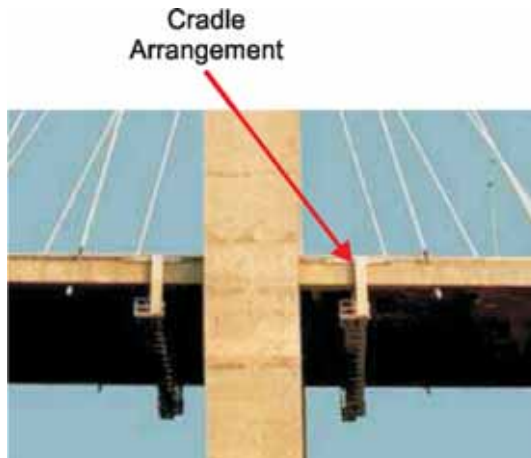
Cradle arrangement for bridge inspection
